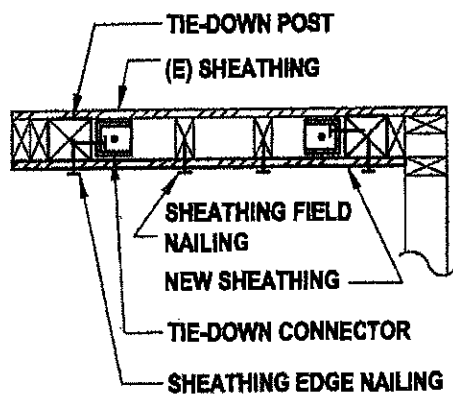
Enhanced Shear Wall With Sheathing Overlay
